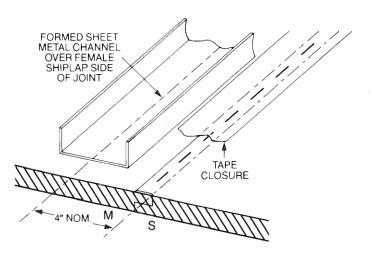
CHANNEL REINFORCEMENT OFFSET TO CLEAR CLOSURE ON DUCTS 48" AND OVER
